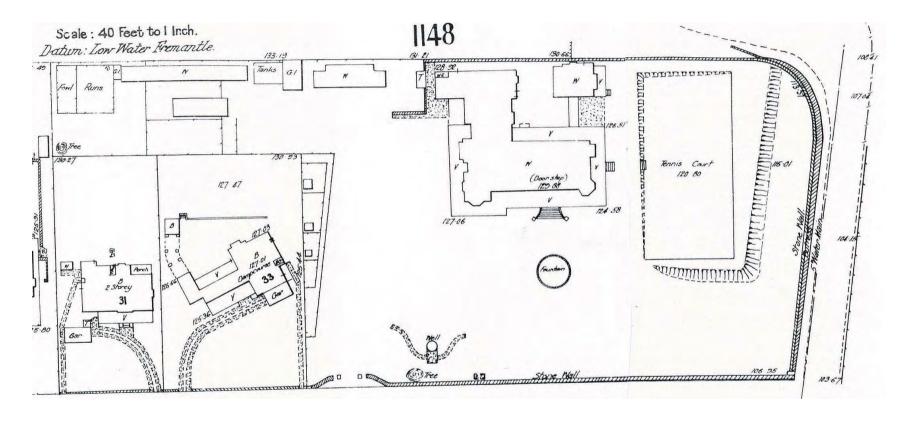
Sewerage plan of the site, 1937, MWSS & DD.
